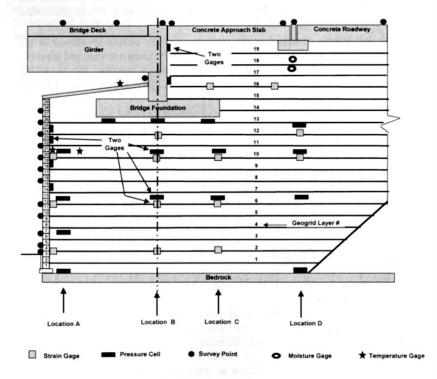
Instrumentation Layout at Section 800 (Phase II structure)
